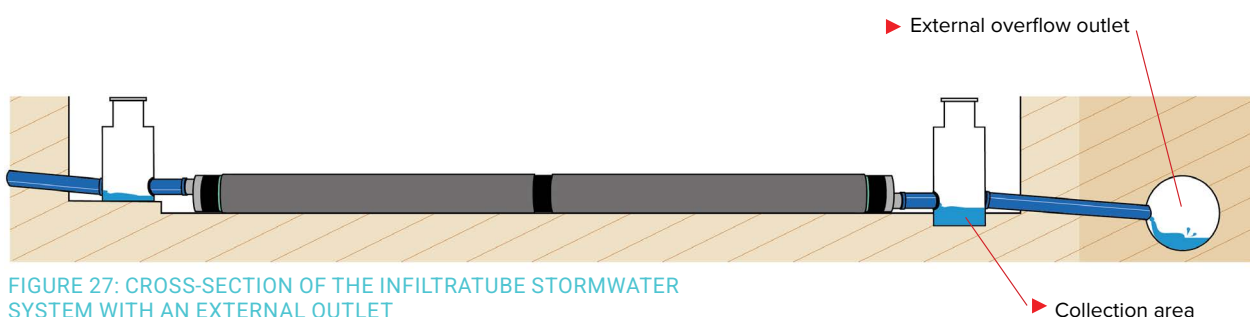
CROSS-SECTION OF THE INFILTRATUBE STORMWATER SYSTEM WITH AN EXTERNAL OUTLET
